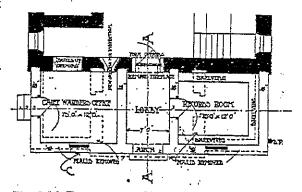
Front rooms of 'A wing'. Detail of a plan dated 1990 signed by W.L Vernon showing the reconstruction (DPW&S Plan Room No. 321/19)
